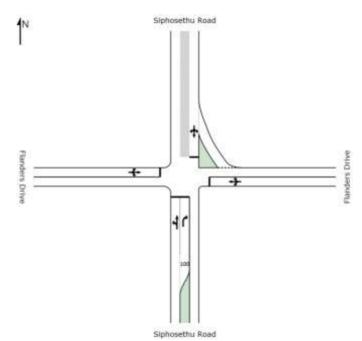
Future layout of Flanders Drive/ Siphosethu Road
